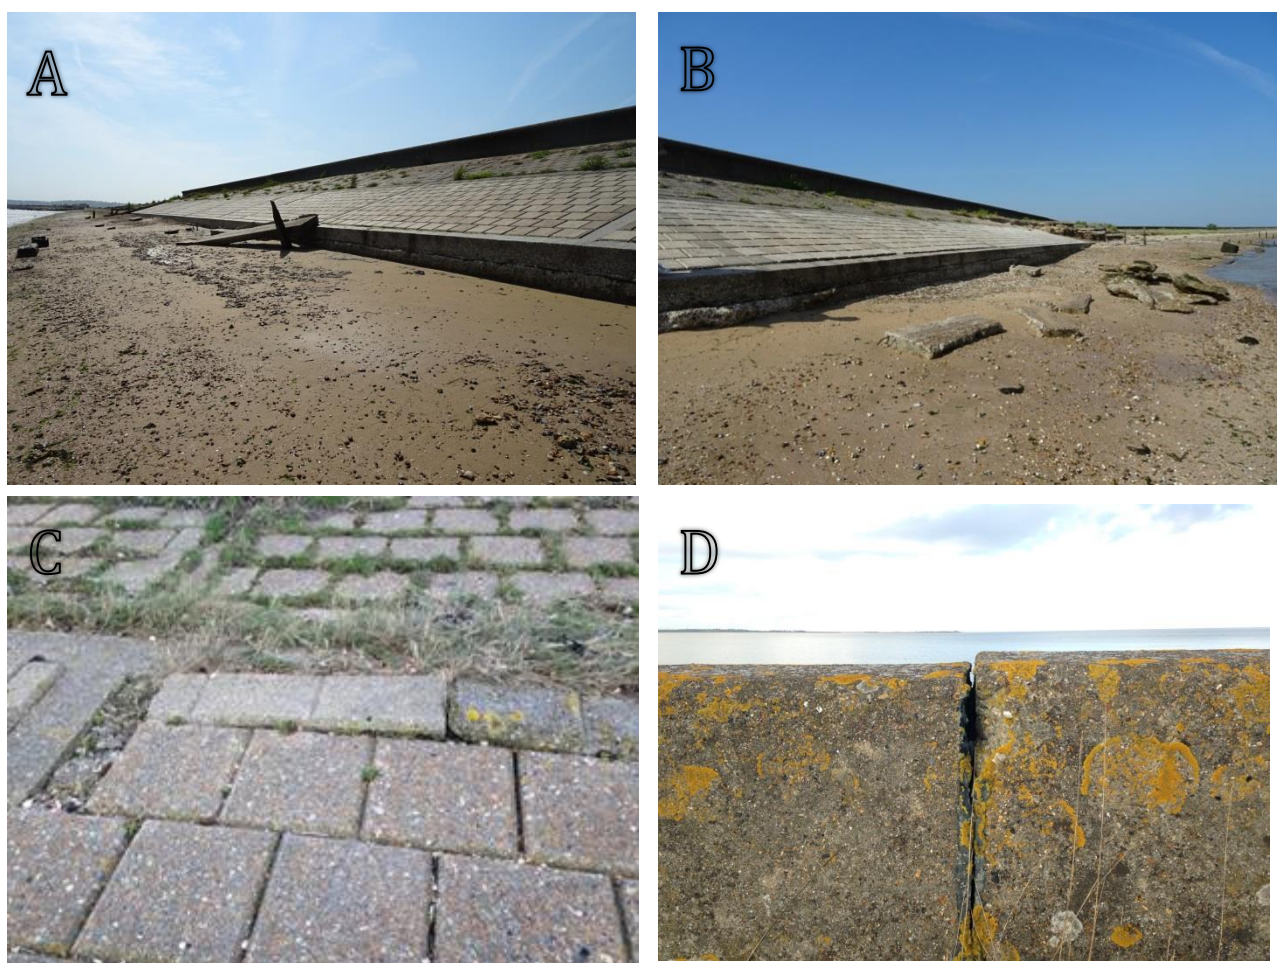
(A) AND (B) UNDERMINING PRESENT NEAR THE SPORTSMAN (C) BLOCKWORK APRON BREAKING AWAY DUE TO PLANT EXTRUSION AND (D) JOINT SEALANT MISSING AND SOME SETTLEMENT IN PRECAST CONCRETE SECTIONS
